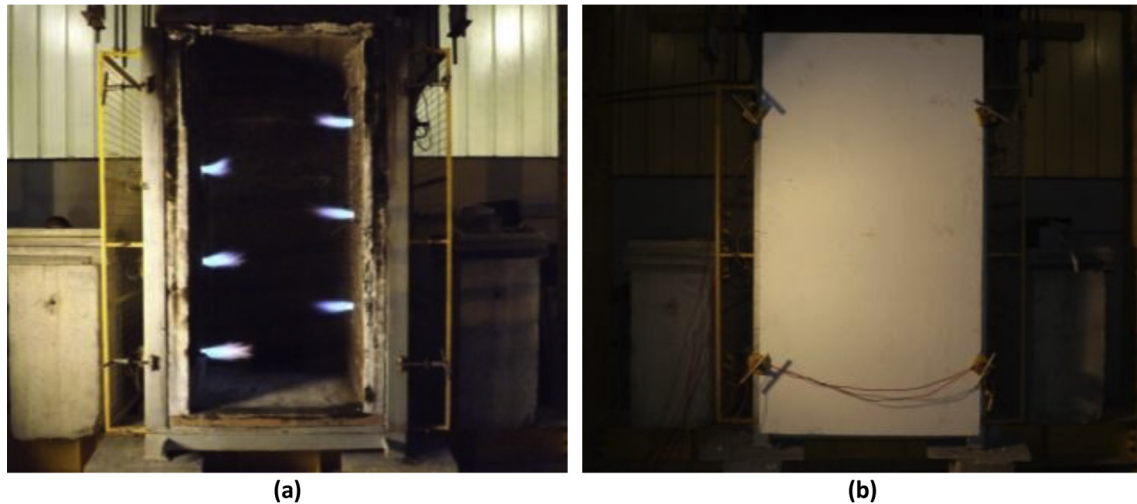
Vertical furnace: (a) 6 gas burners fired; (b) frontal opening covered by a wall assembly.
